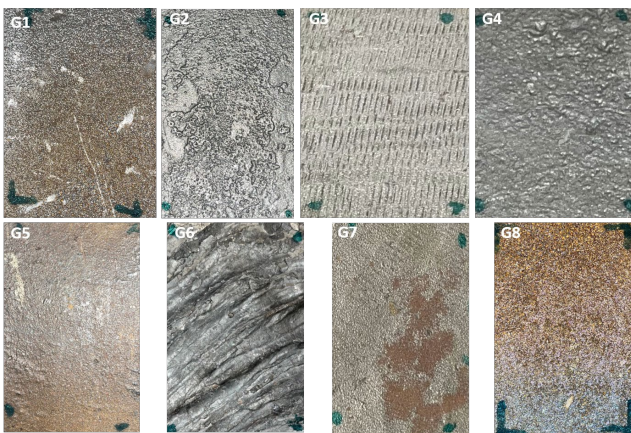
Gage R&R Study 2: Photographs of inspected surfaces.
